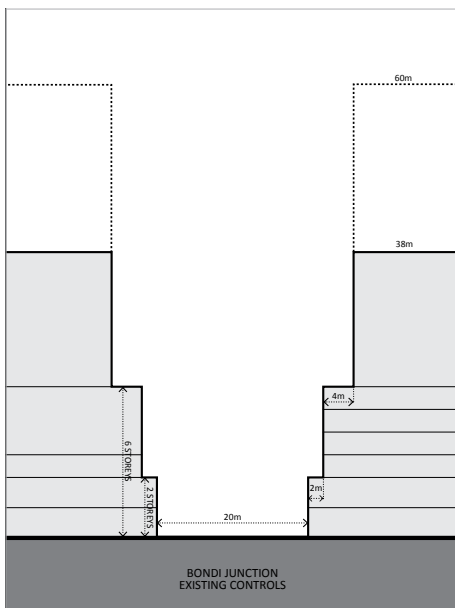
Street Alignment, Front Setbacks and Tower Building Form - Bondi Junction DCP 2012
